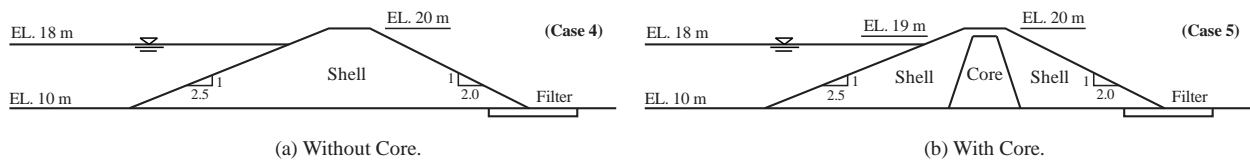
Profile section of the dam models applied on impermeable foundation.
